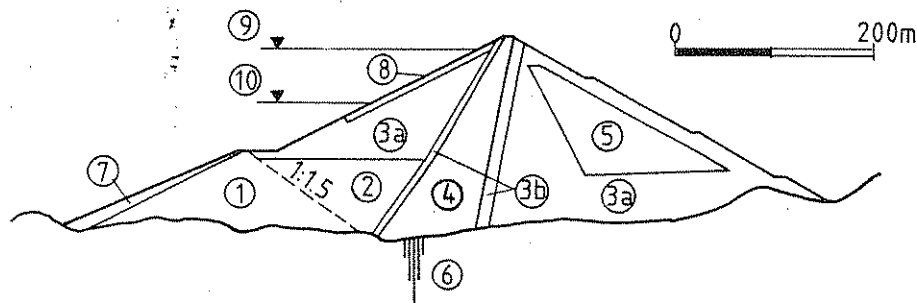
Bakun rockfill dam with inclined earth core. Previous tender design 1986 (courtesy of LI).
